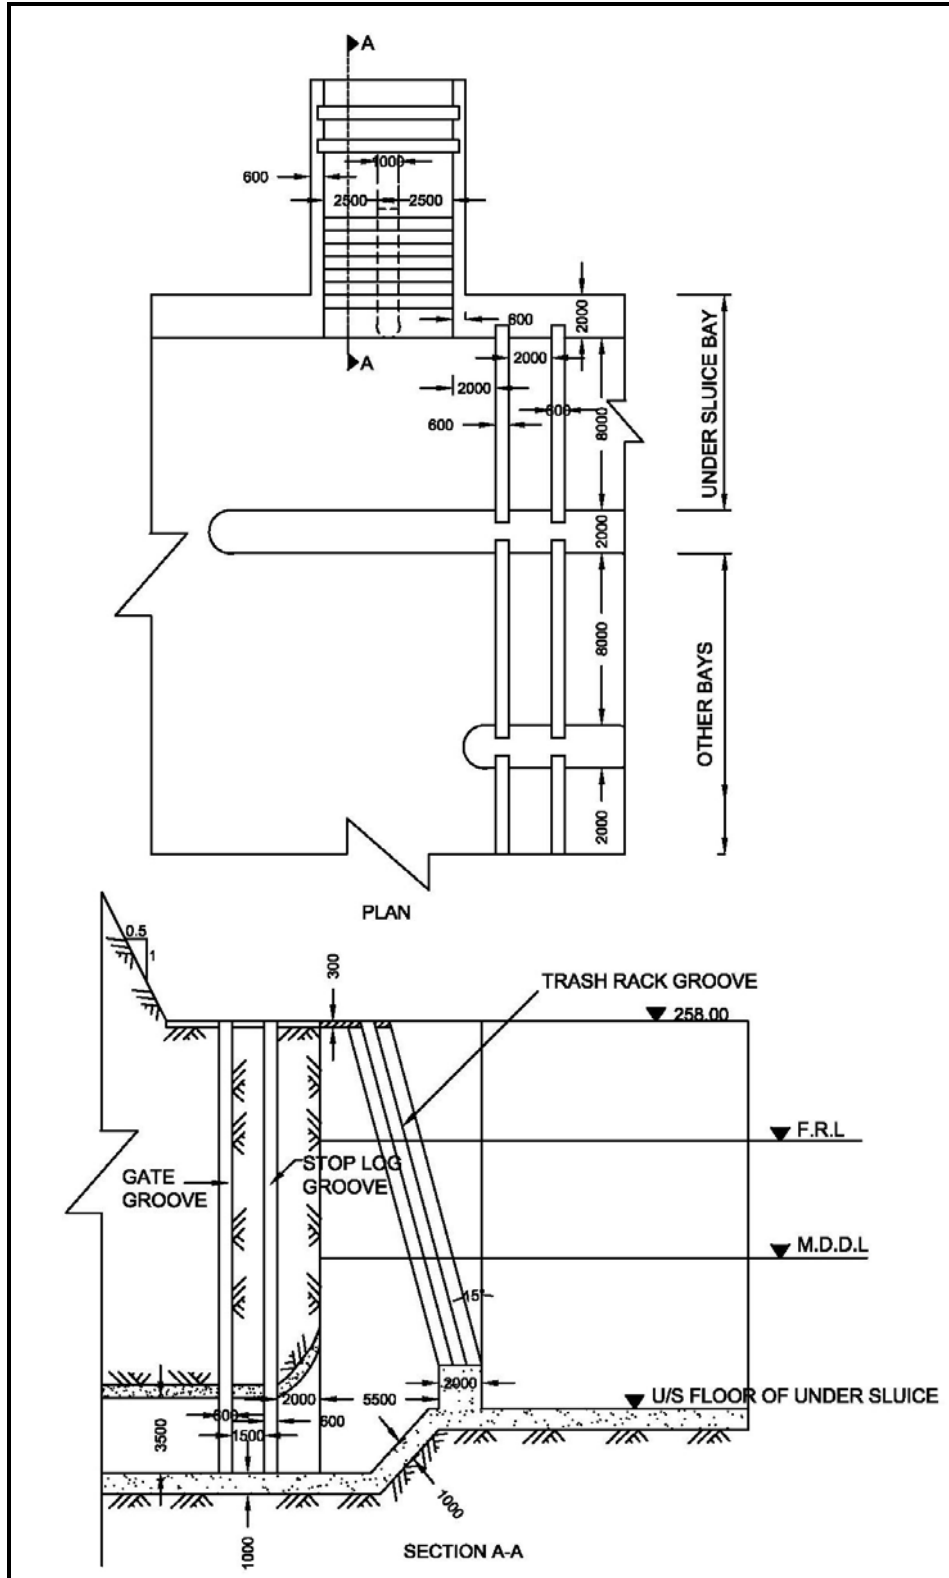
Typical Intake Details Upstream of Raised Weir / Barrage
